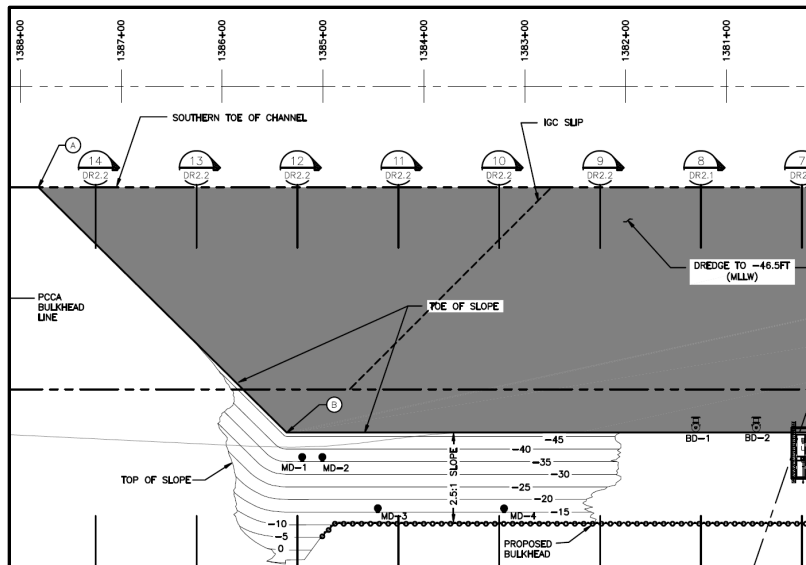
Excerpt of EPIC Marine Terminal dredging construction plan the Orion project engineer emailed to the Enterprise Products gas pipeline technician on June 29, 2020 indicating the dredge limits shaded in gray.
